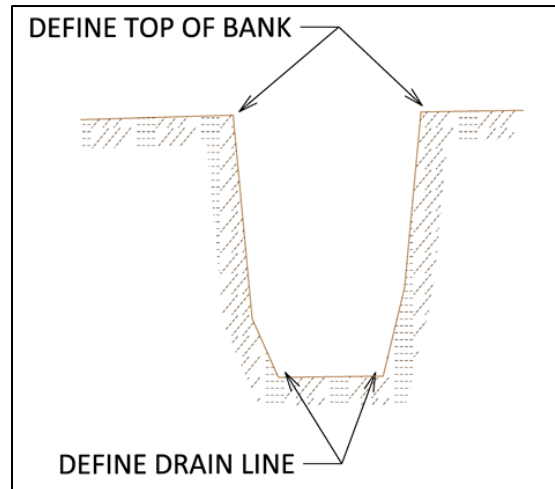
Example Outfall Drainage Survey Detail – Cross Section
